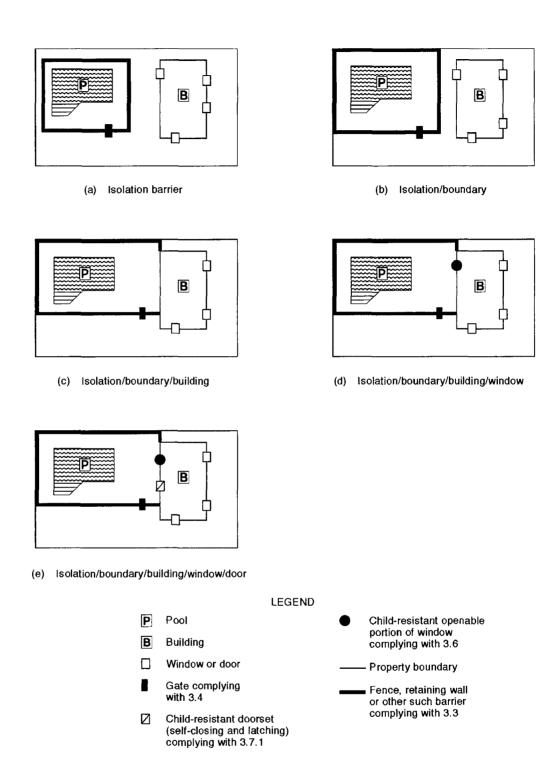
Typical examples of outdoor pool barriers (not to scale)
